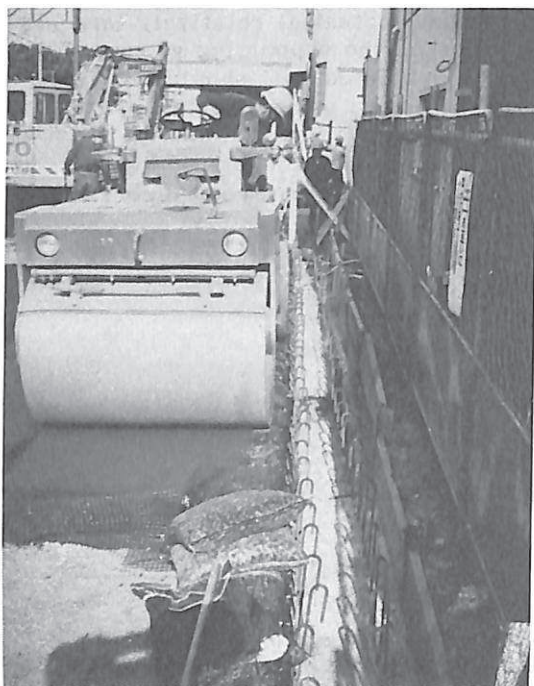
(left) Mechanical compaction until the wall face by using a large compaction plant for a GRS retaining wall in Tokyo for Seibu railway.
